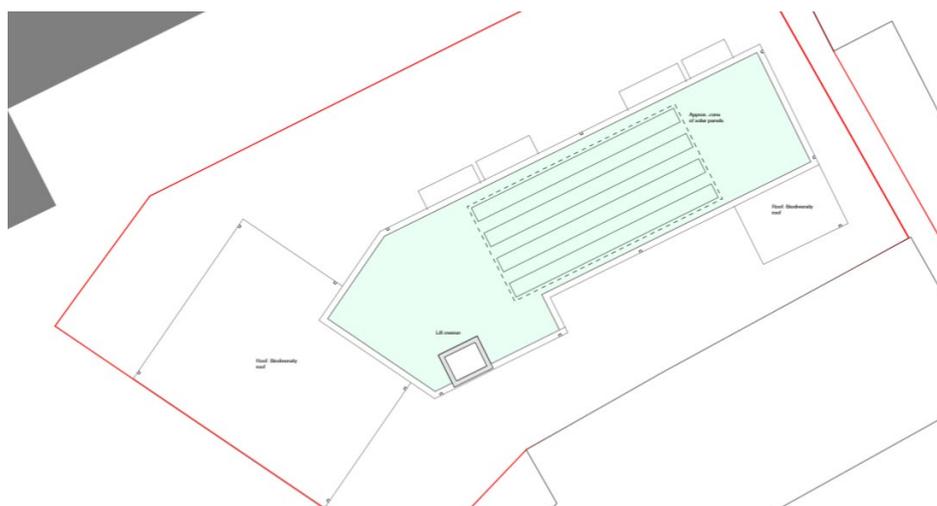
Roof plan showing biodiversity roofs and position of solar photovoltaics.
